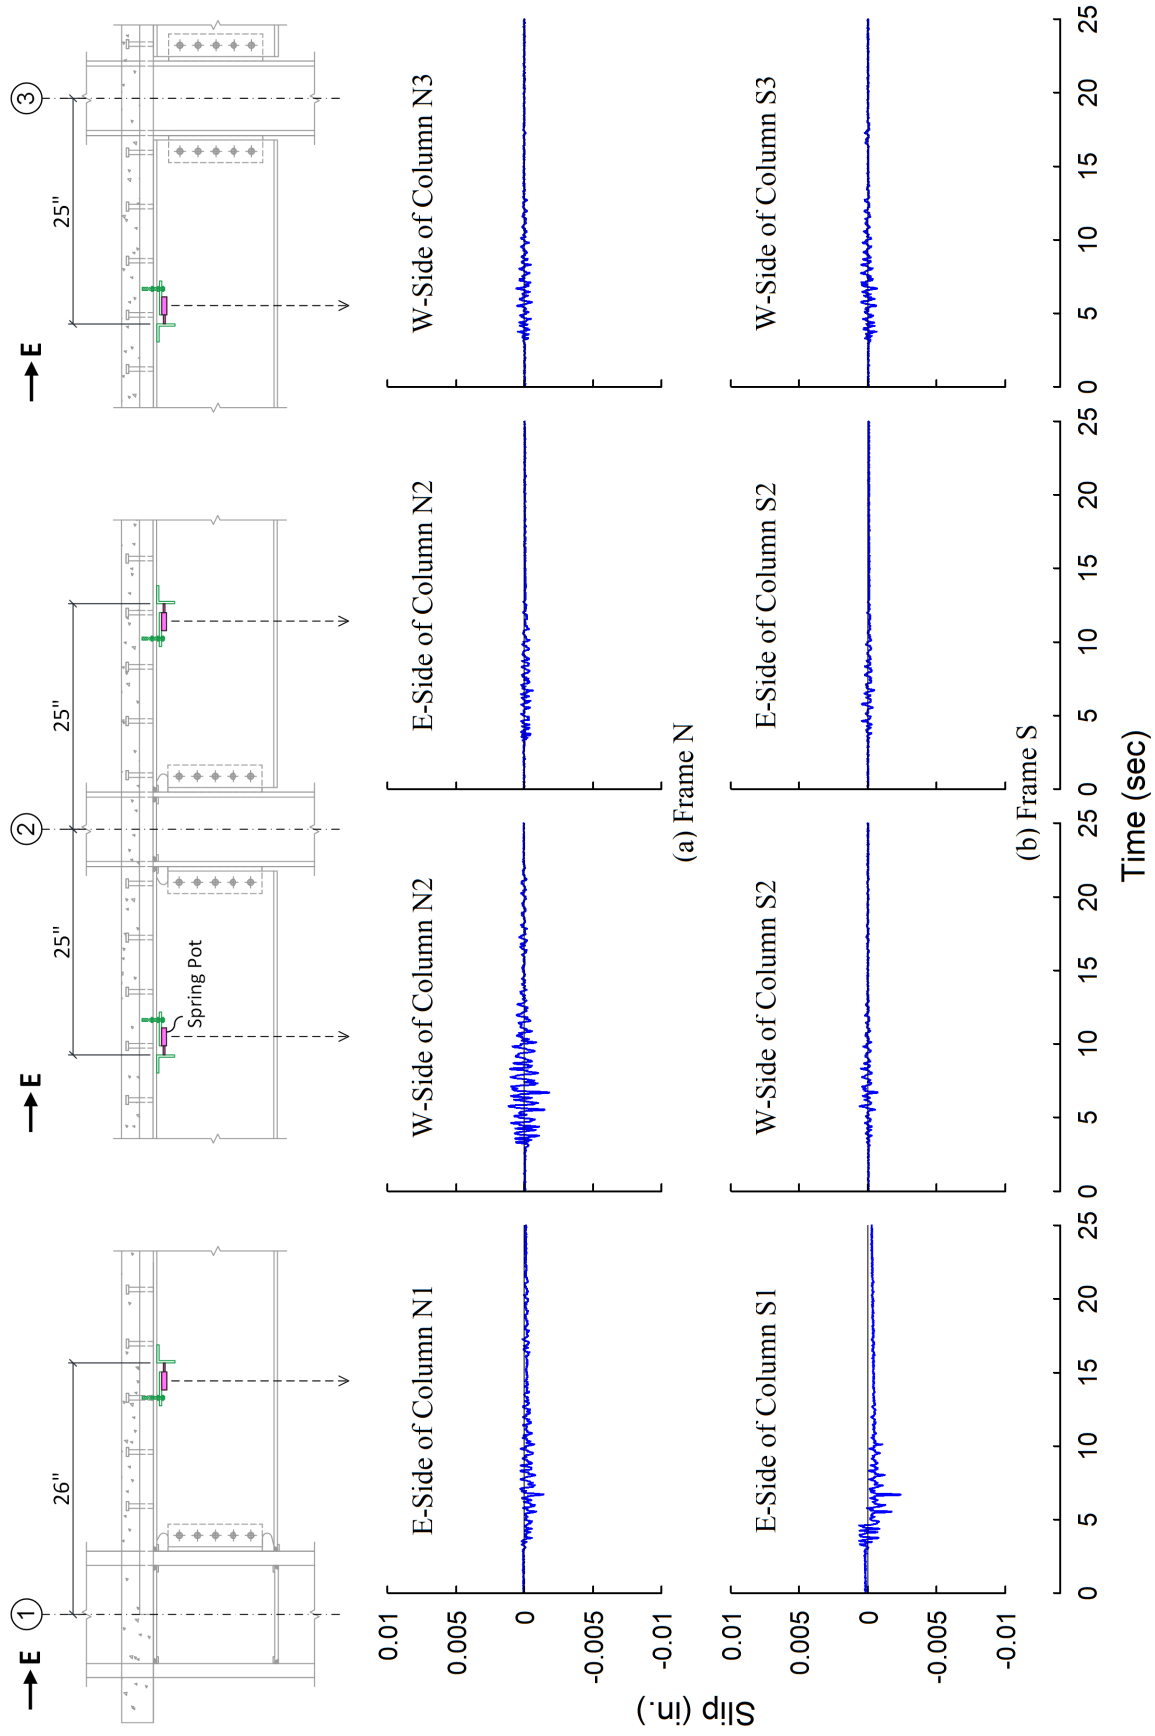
Test 1-3: Slips between Concrete Slab and Steel Collector Beams
